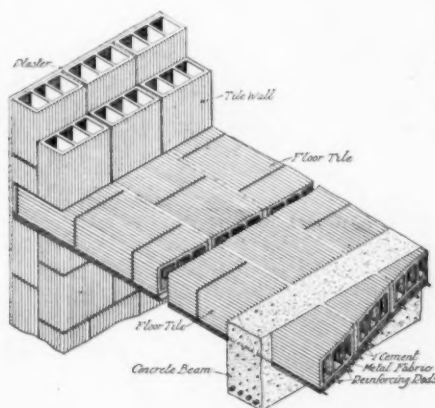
Isometric View, Showing Constructional Details of Walls and Floors in Mr. Bergstrom's Residence at Los Angeles, Cal.
